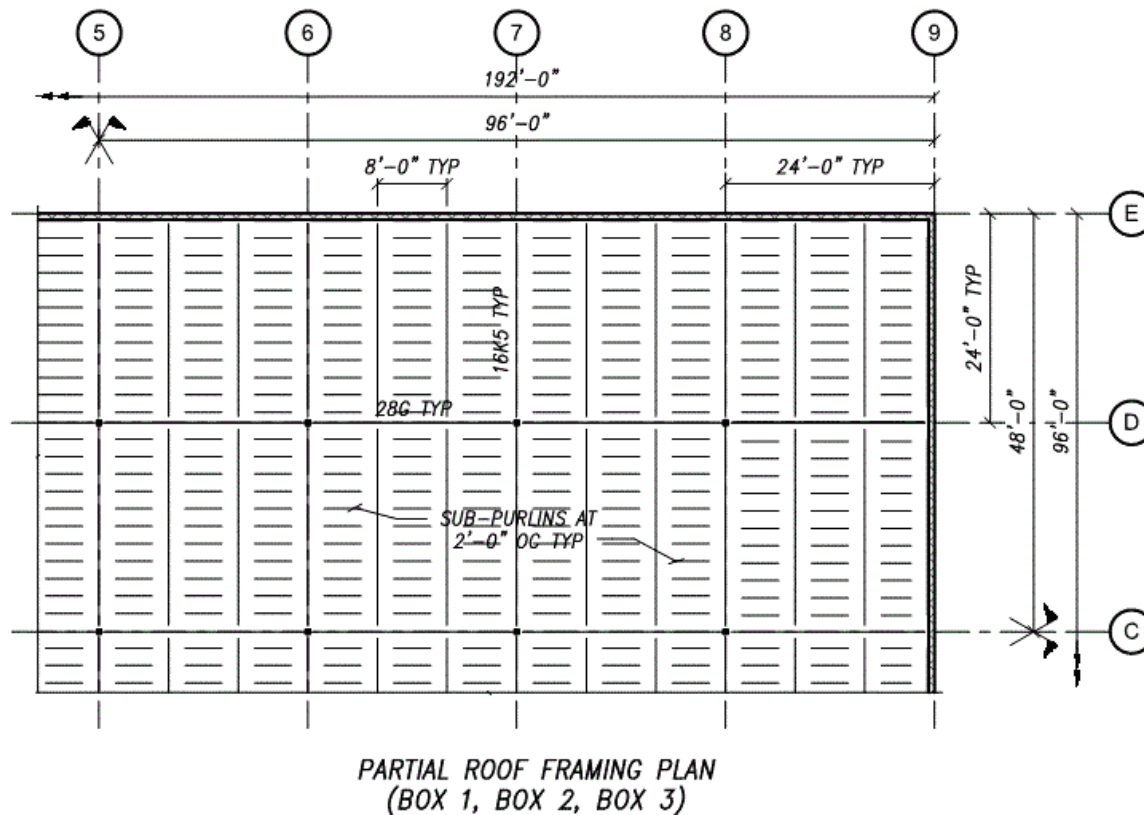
Single-story retail/industrial/warehouse building roof framing configuration: BOX1, BOX2, BOX3.
